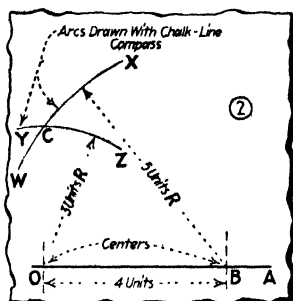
Second operation in laying out a right-angle conduit bend.
